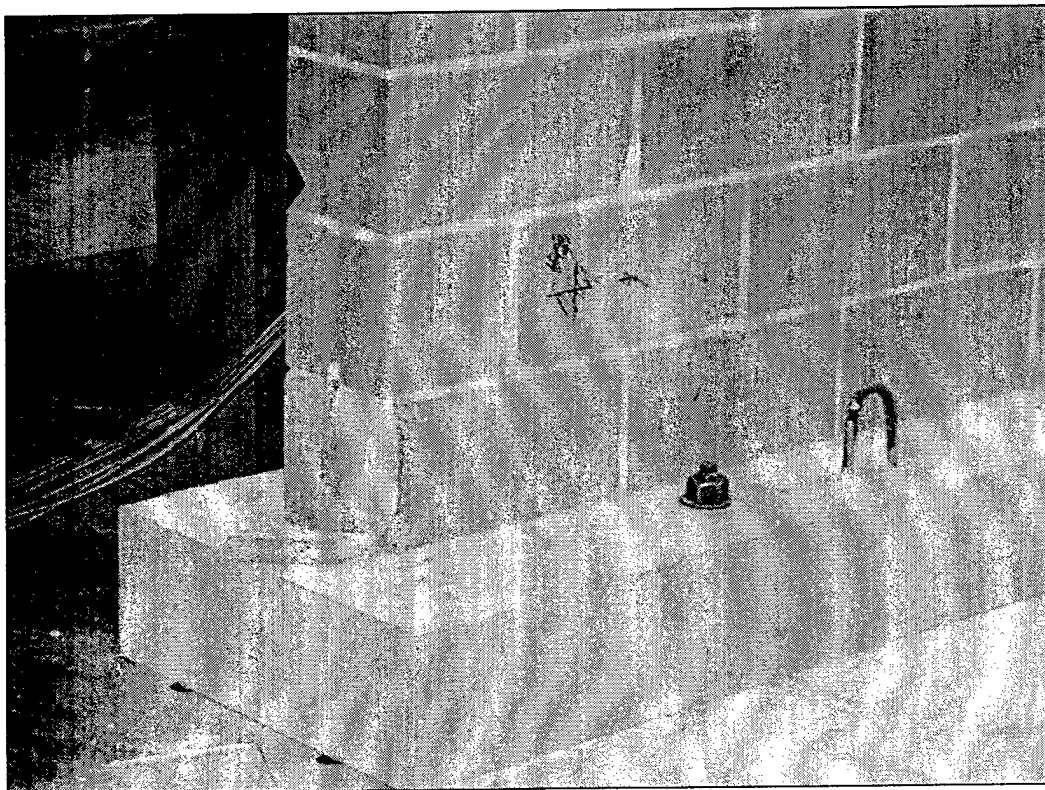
Edge spalling resulted from Seismic Test EQ-1 of the unprotected south wall.
